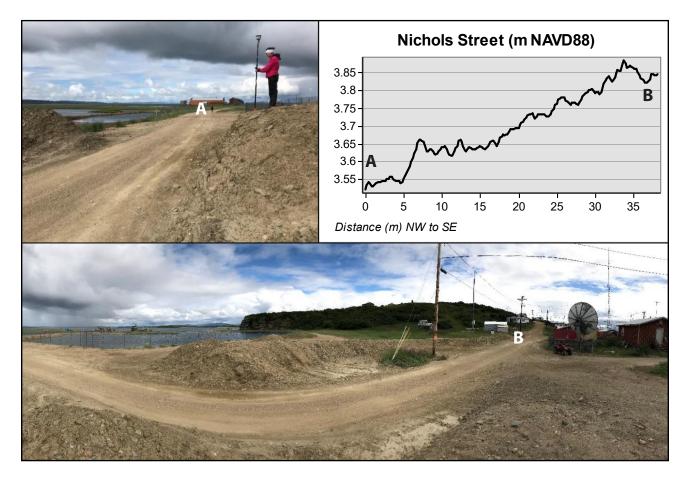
(Top left) Nichols Street flood berm in August 2018, looking towards abandoned cannery. (Top right) elevation profile of Nichols Street between the barriers. (Bottom) panorama of Nichols Street shows beach access road to the left and road to high ground to the right).
